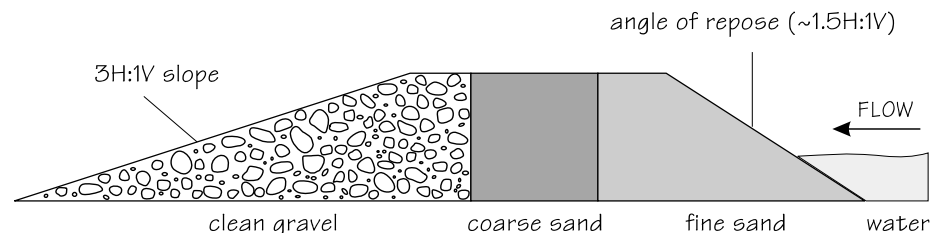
Idealized cross section of a filter berm showing details of construction.
